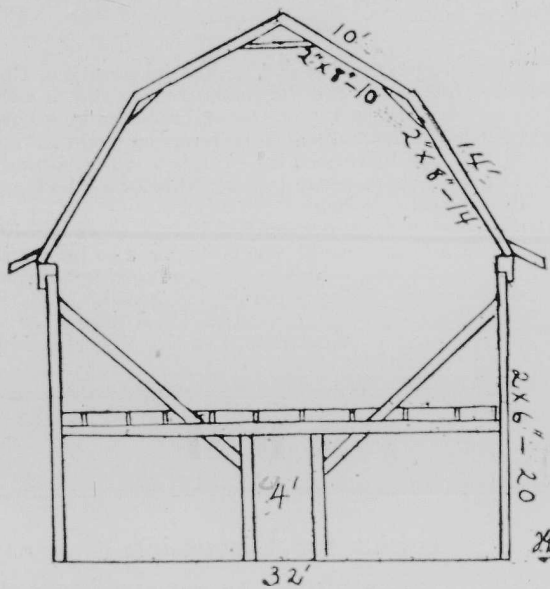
THIS STYLE OF ROOF HAS BEEN USED ON BARN UP TO 40 FEET IN WIDTH.
